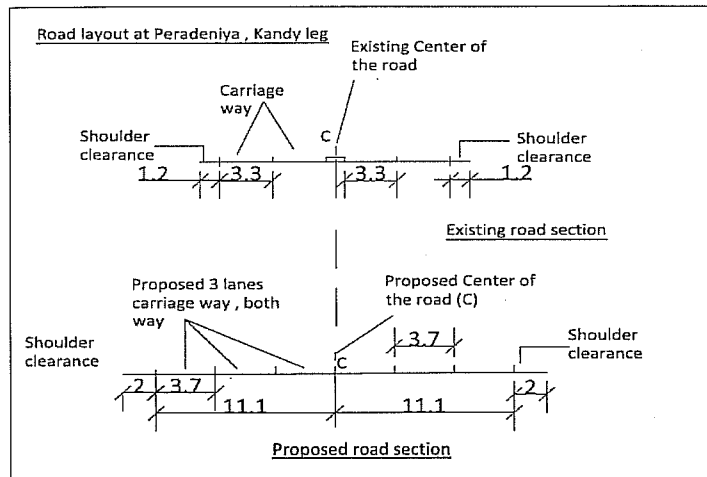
Carriage details of existing and proposed sections (Kandy leg)
